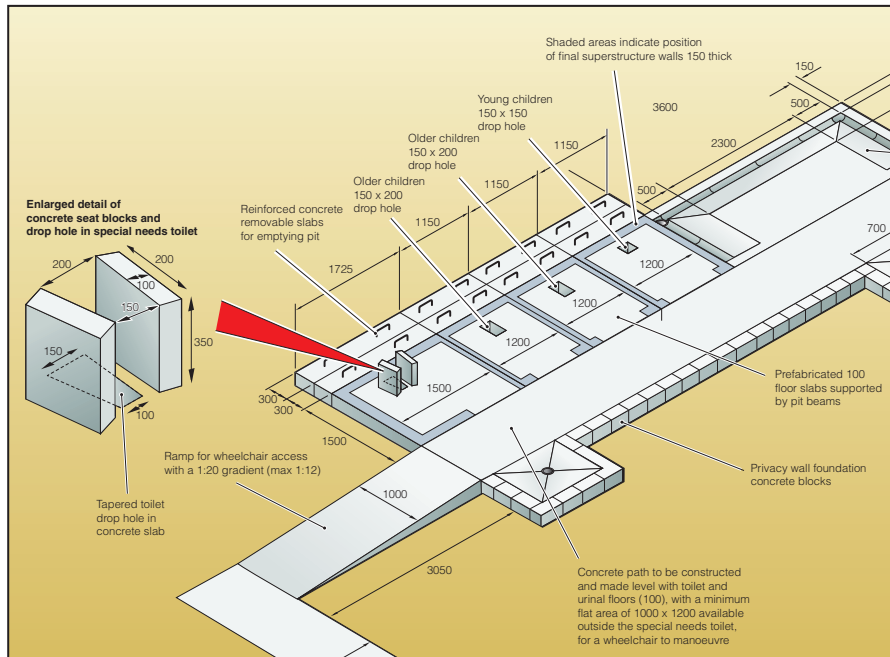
Floor construction: cement block or burnt brick with concrete slab (boys) ⁹
